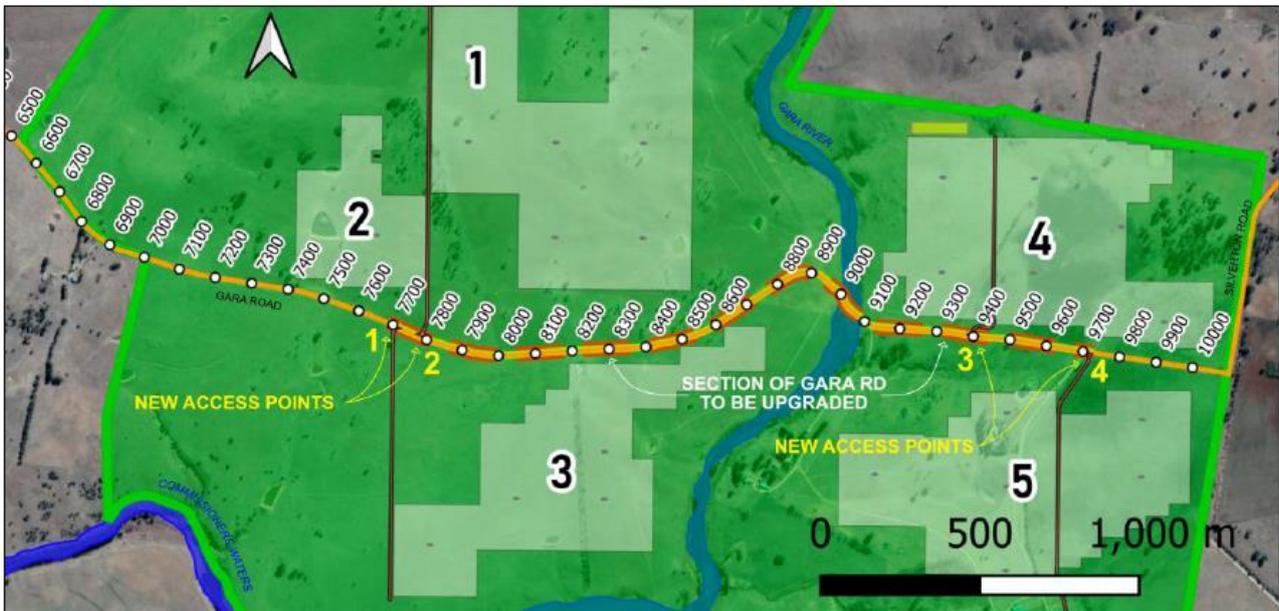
Location of accesses off Gara Road within the proposal site.
